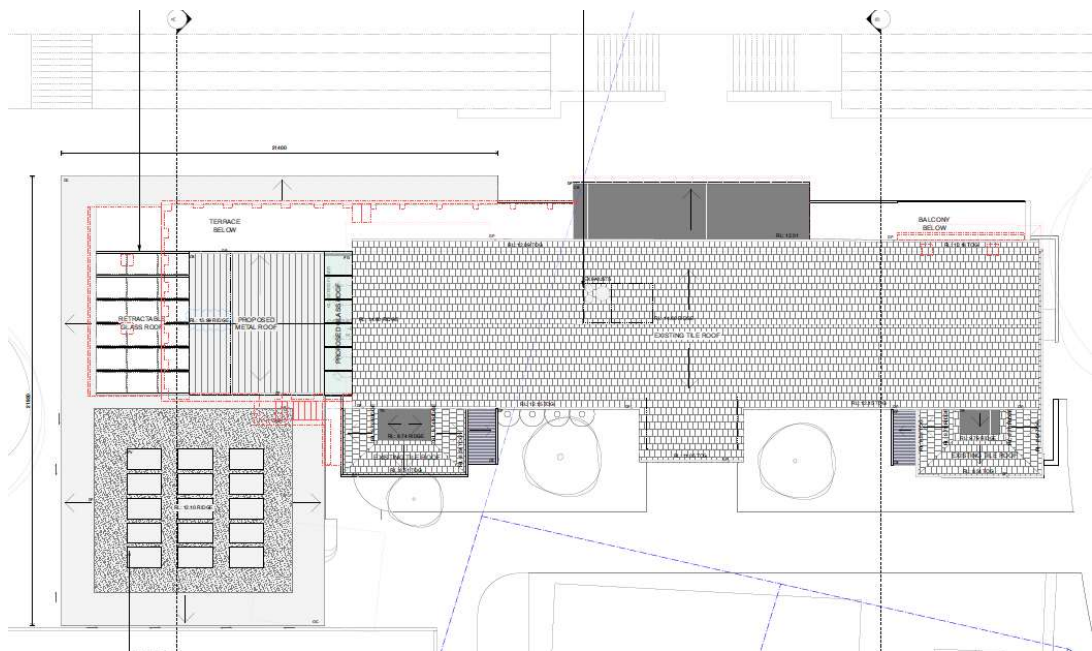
Roof plan - demonstrating glass roof defining a separation between the new roof from the existing. Contemporary roof, terrace shading, and solar panels all located in new work, leaving existing roof form undisturbed. (Source: Adriano Pupilli Architect)
